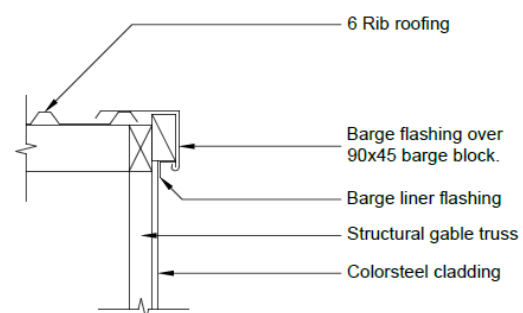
Roof barge detail (used with permission from Versatile Homes and Buildings)
